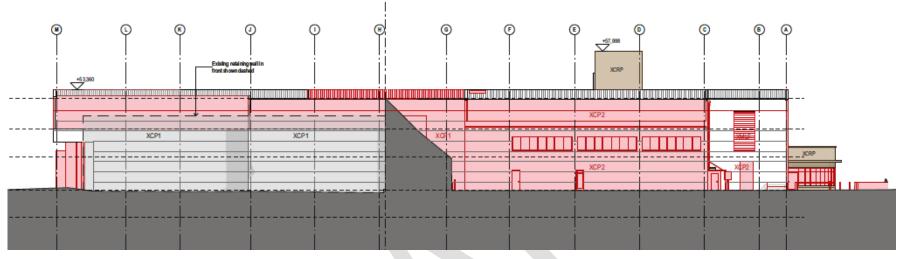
Eastern elevation demolition plan (Source: TZG Architects, A-036, Revision A, October 2019)
